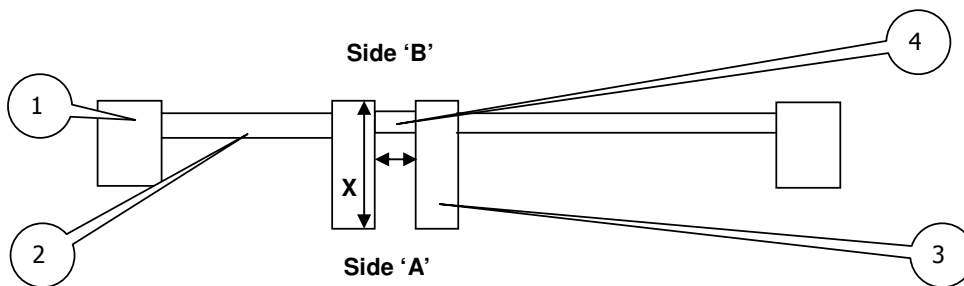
test configuration for horizontally oriented cavity barriers within walls (elevation)
